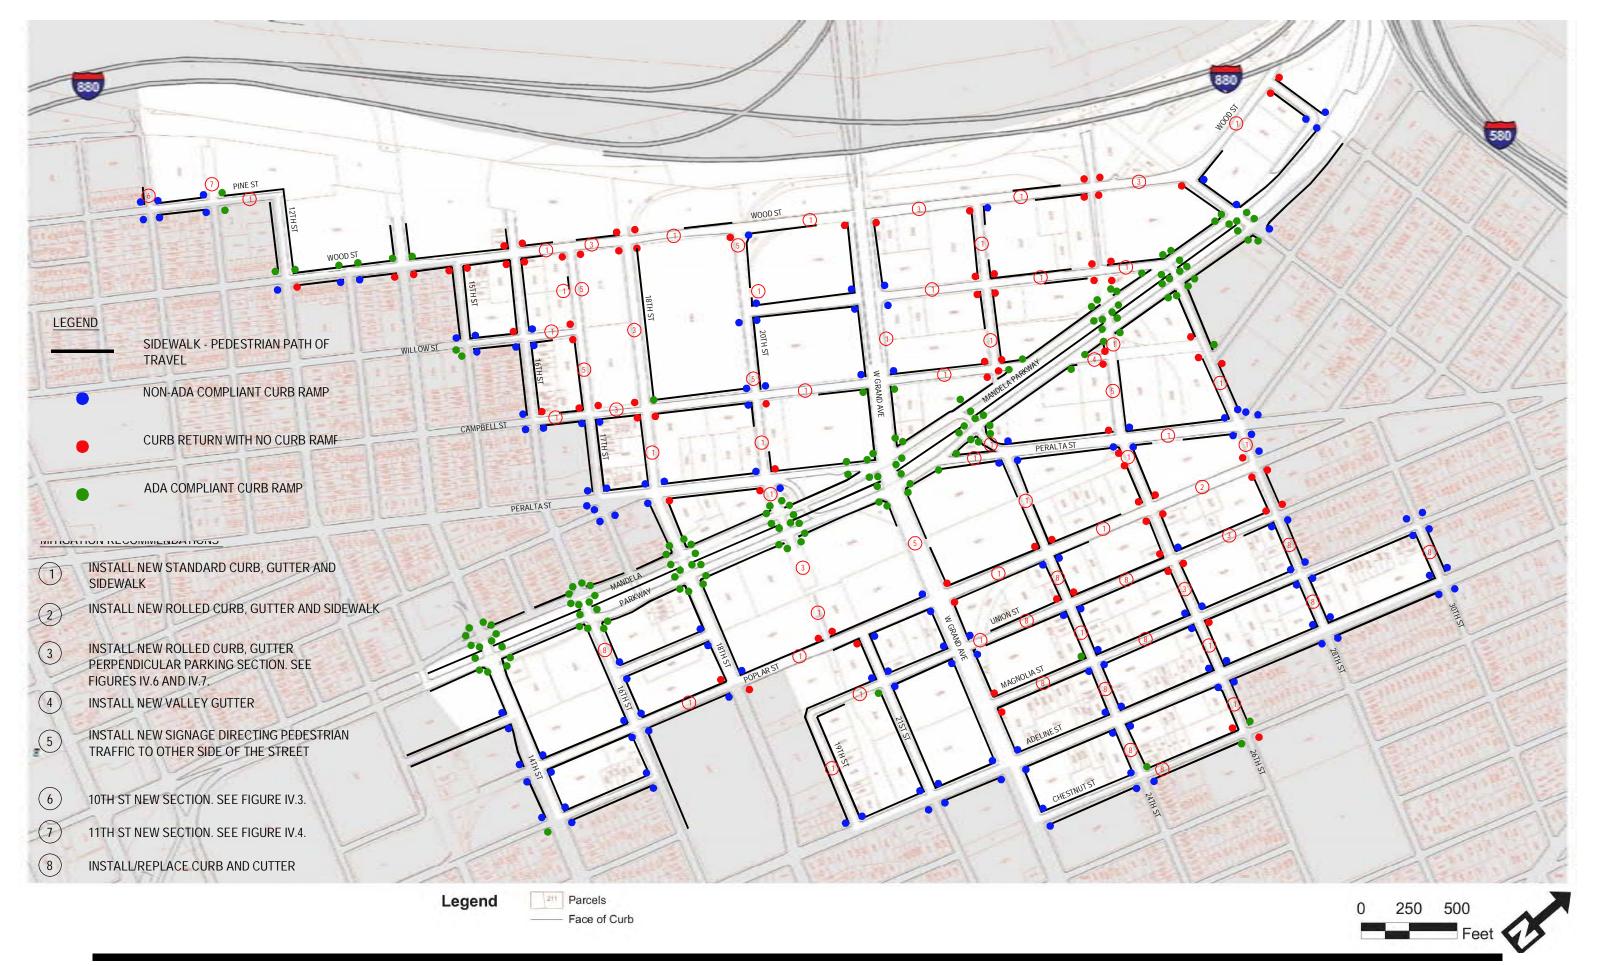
Potential 3rd Street Sidewalk Improvement
